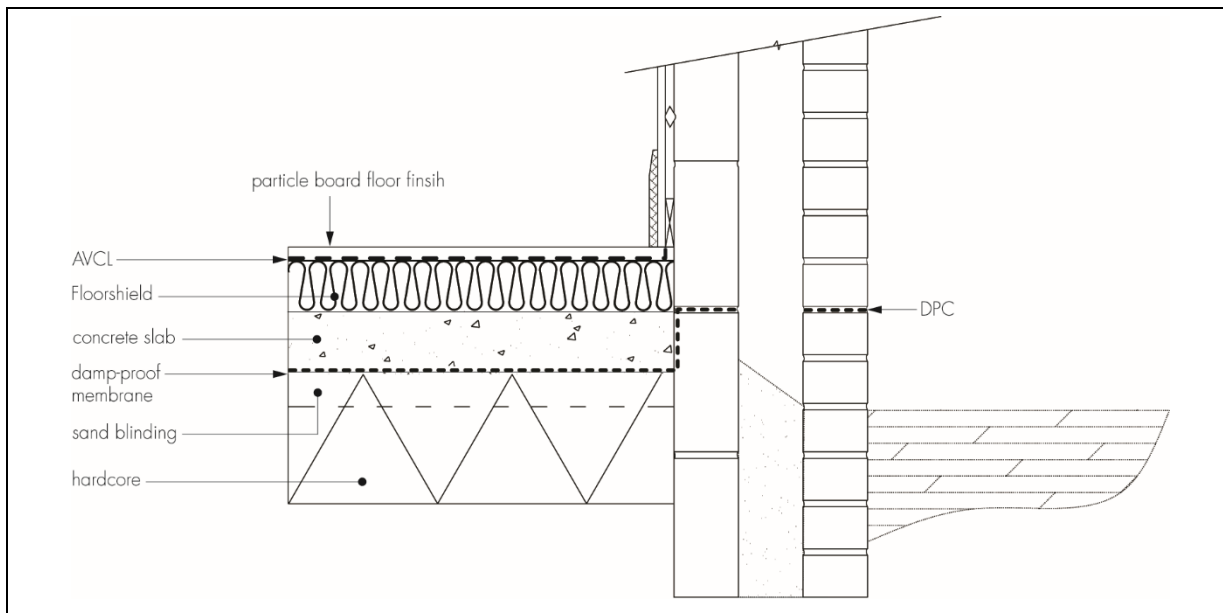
Typical installation details — under concrete slab (DPM under insulation)
